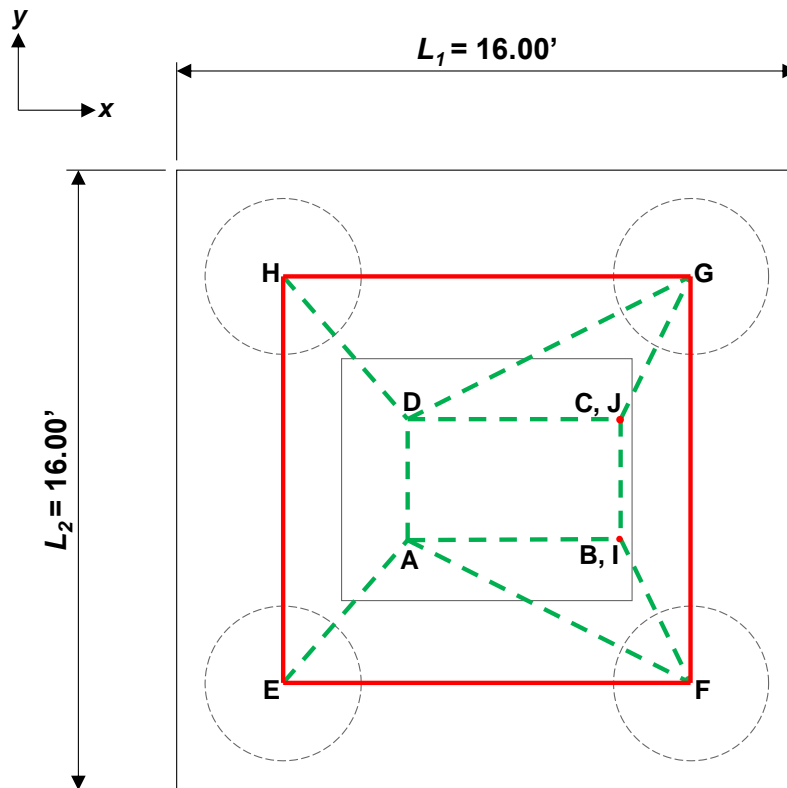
Strut-and-tie model for the drilled-shaft footing – plan view (first load case)
